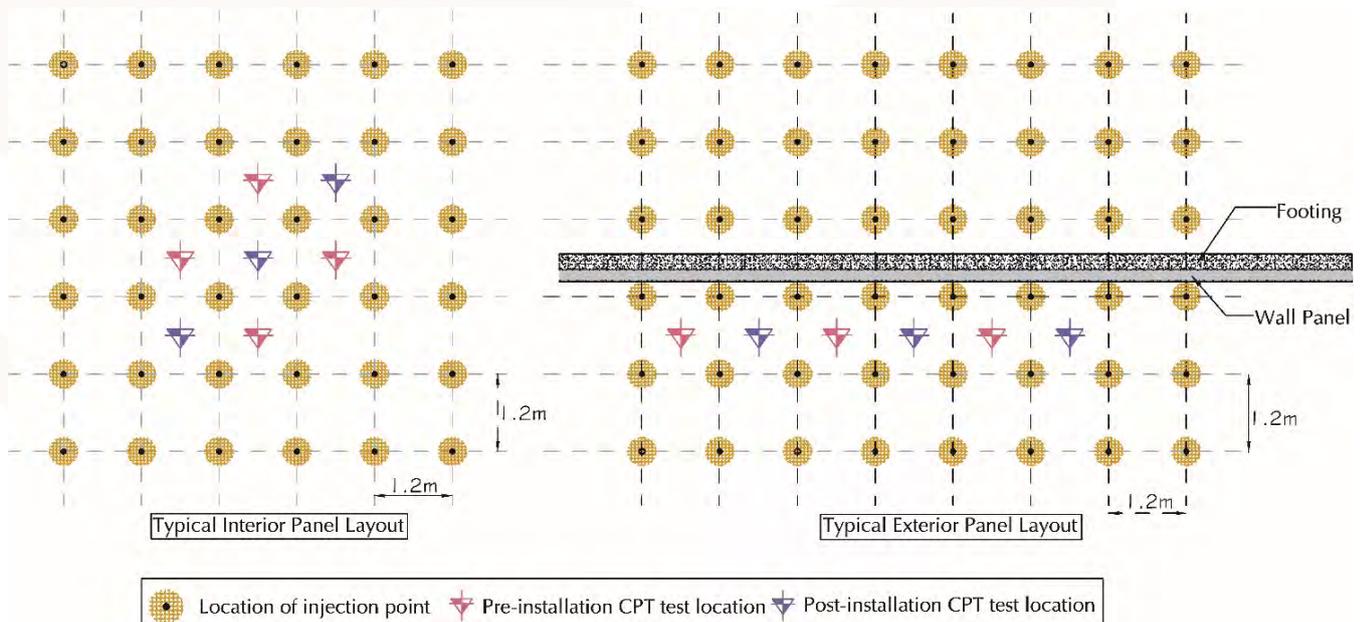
Typical test panel layouts commercial shopping centre (plan view)
